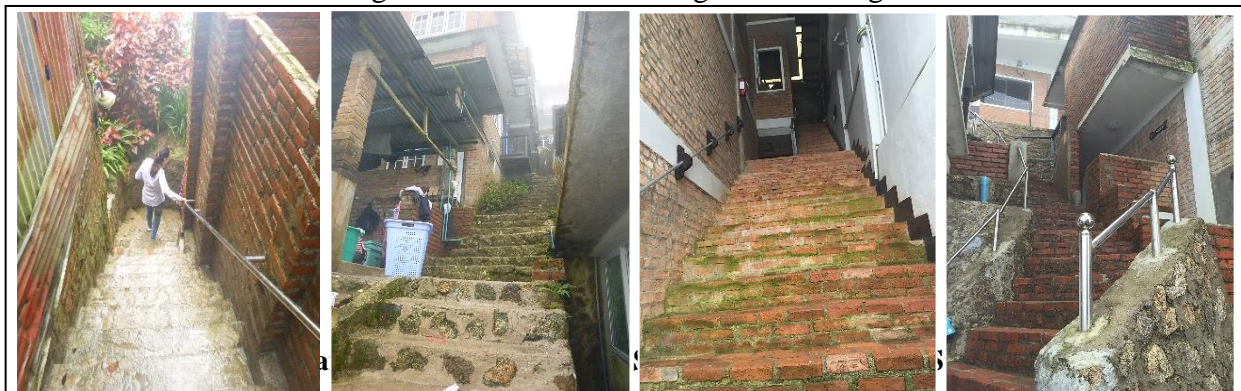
Stairway Constructed with Stones and Bricks with Steel Handrails
